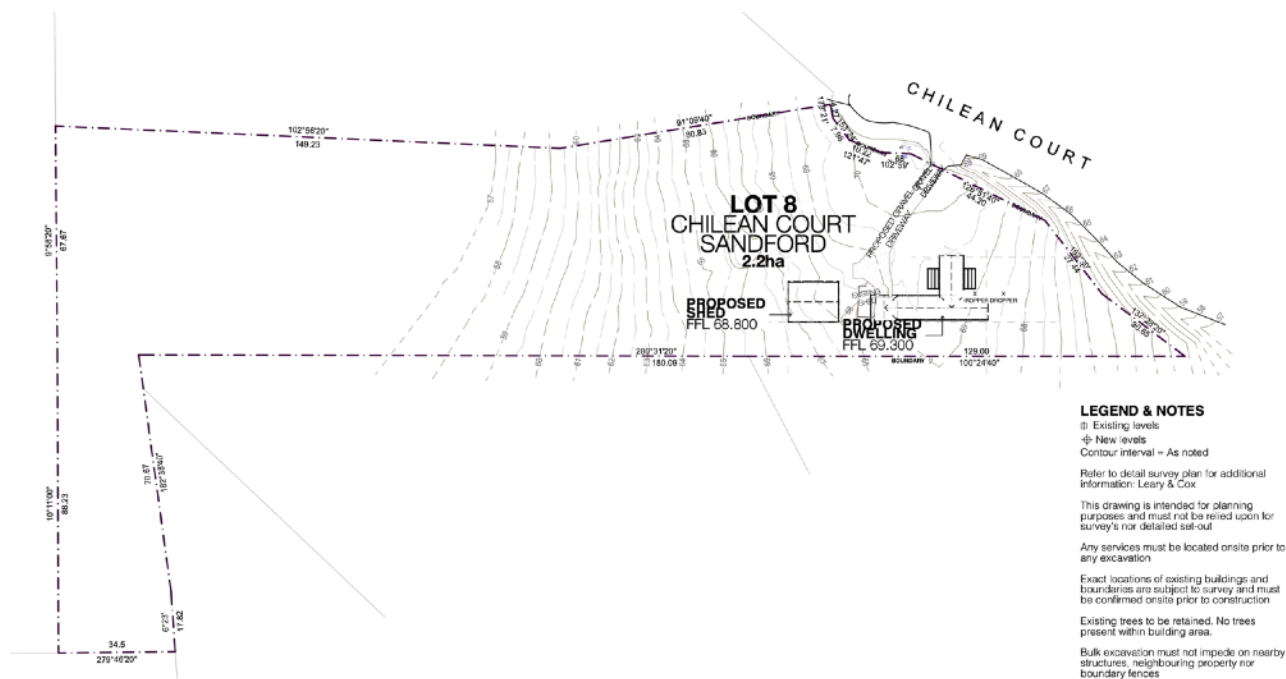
PROPOSED DWELLING SITE LAYOUT
